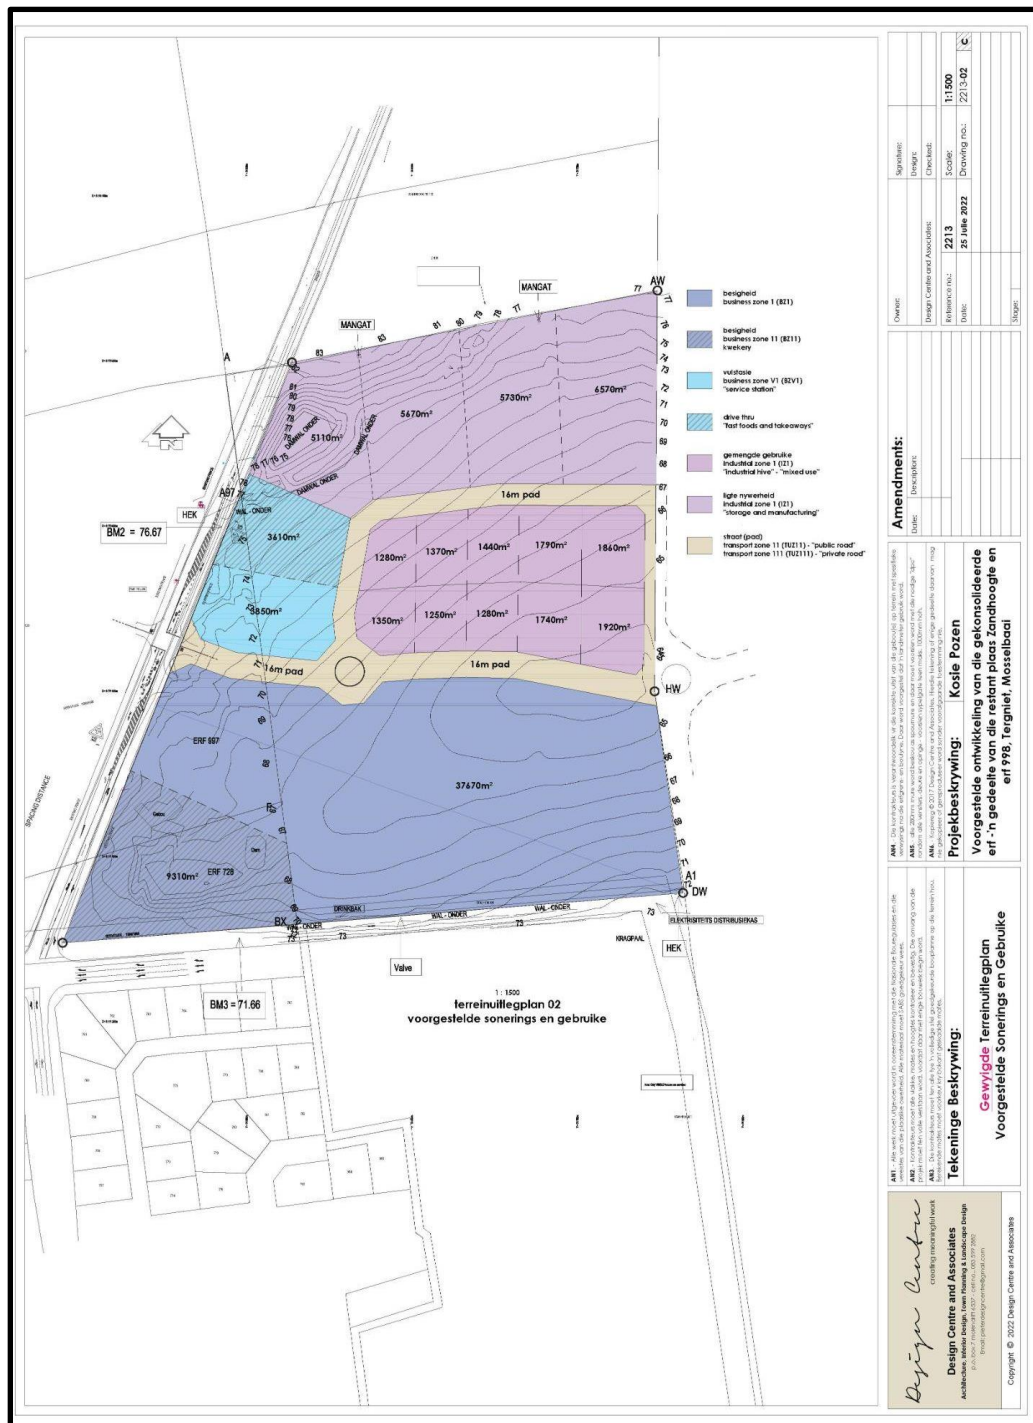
Proposed site development plan (SDP), alternative B, for Erf 998, Tergniet and the Farm Zandhoogte no. 139.
